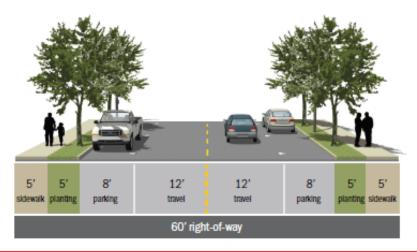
Figure X. Proposed Conceptual Cross-Section for Local Streets with a 60' right of way
